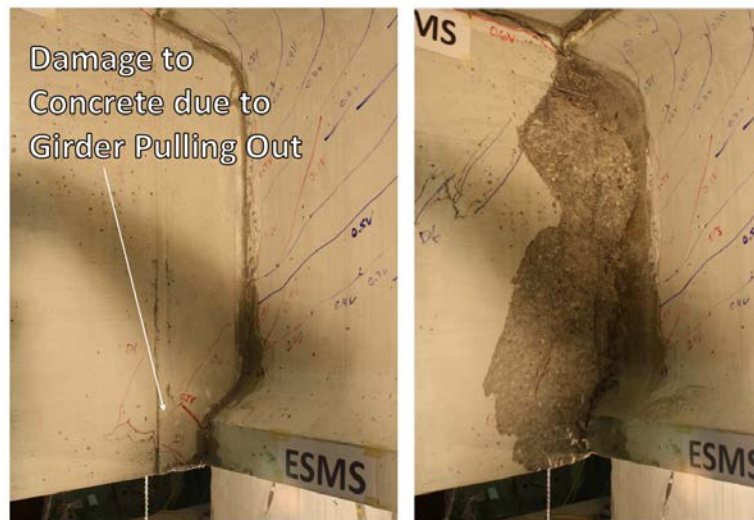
Damage to concrete due to girder pulling out on the diaphragm adjacent to the girder
